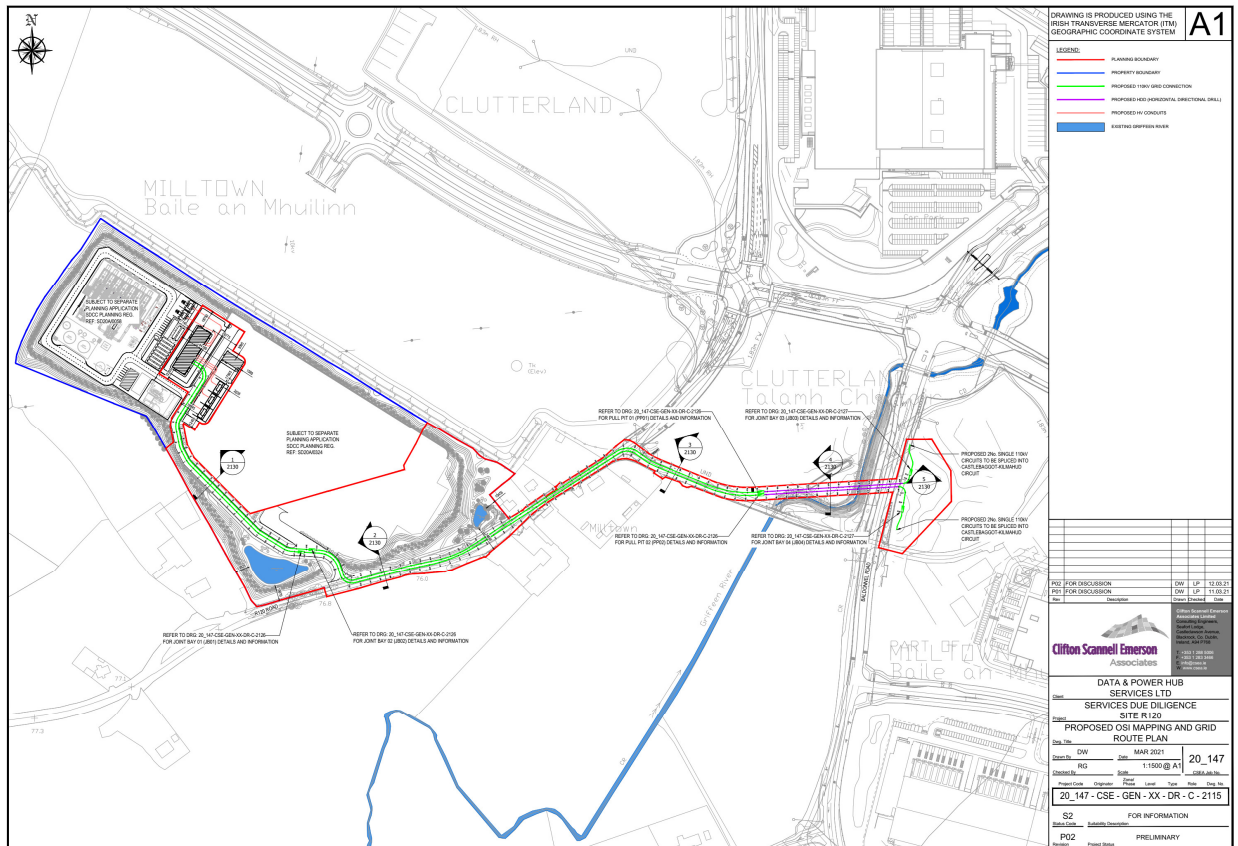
Proposed site layout plan of the Proposed Development site (red line) indicating proposed 110kV transmission lines (green and pink line) well as the permitted development (Source: Drawing no. 20_147-CSE-GEN-00-XX-DR-C-2115, CSEA Consulting Engineers)
